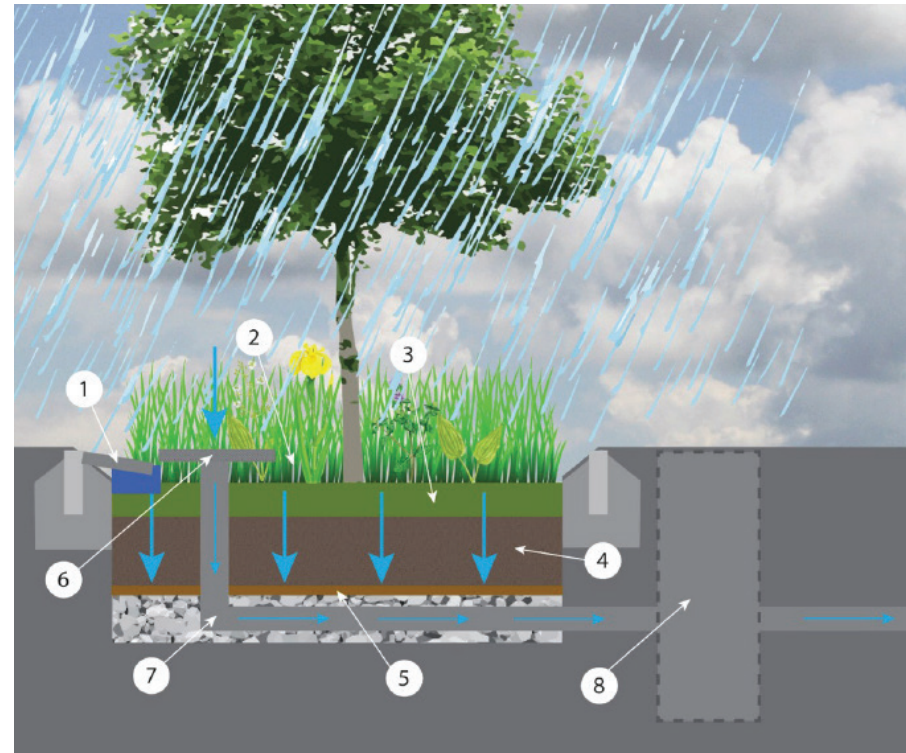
DMURS Guidance Note 5 - Rain Garden Section
